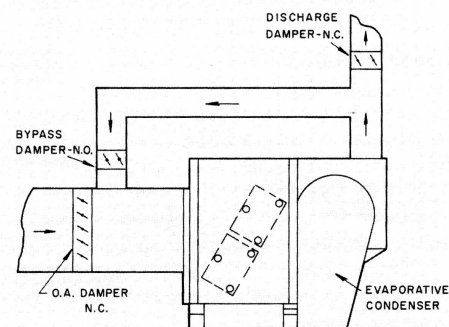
AIR RECIRCULATING ASSEMBLY
